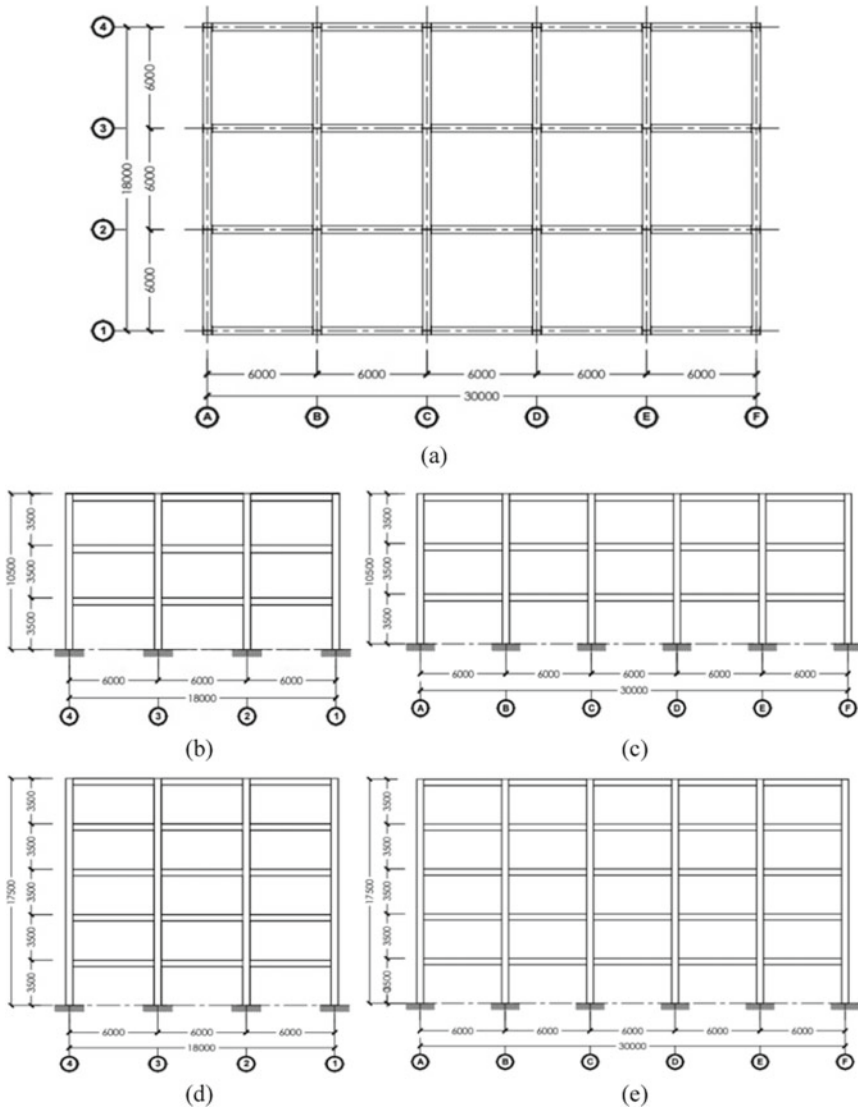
Plan and sections of building. (a) Typical plan of each floor, (b) Cross section of 3-stories building, (c) Long section of 3-stories building, (d) Cross section of 5-stories building, (e) Long section of 5-stories building
